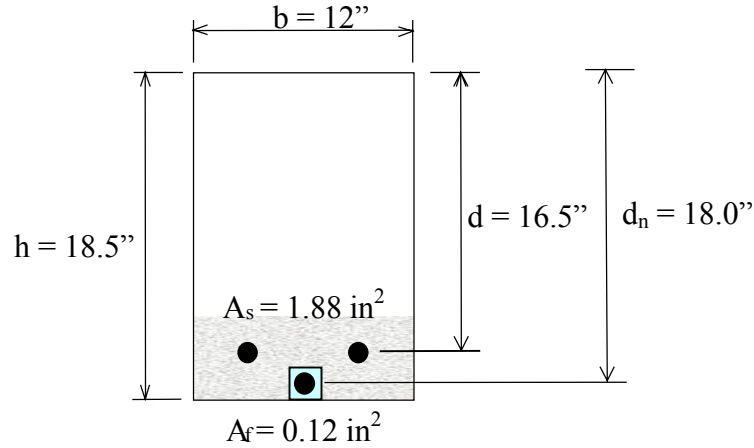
Cross-section of a deck strip showing bridge deck details.
